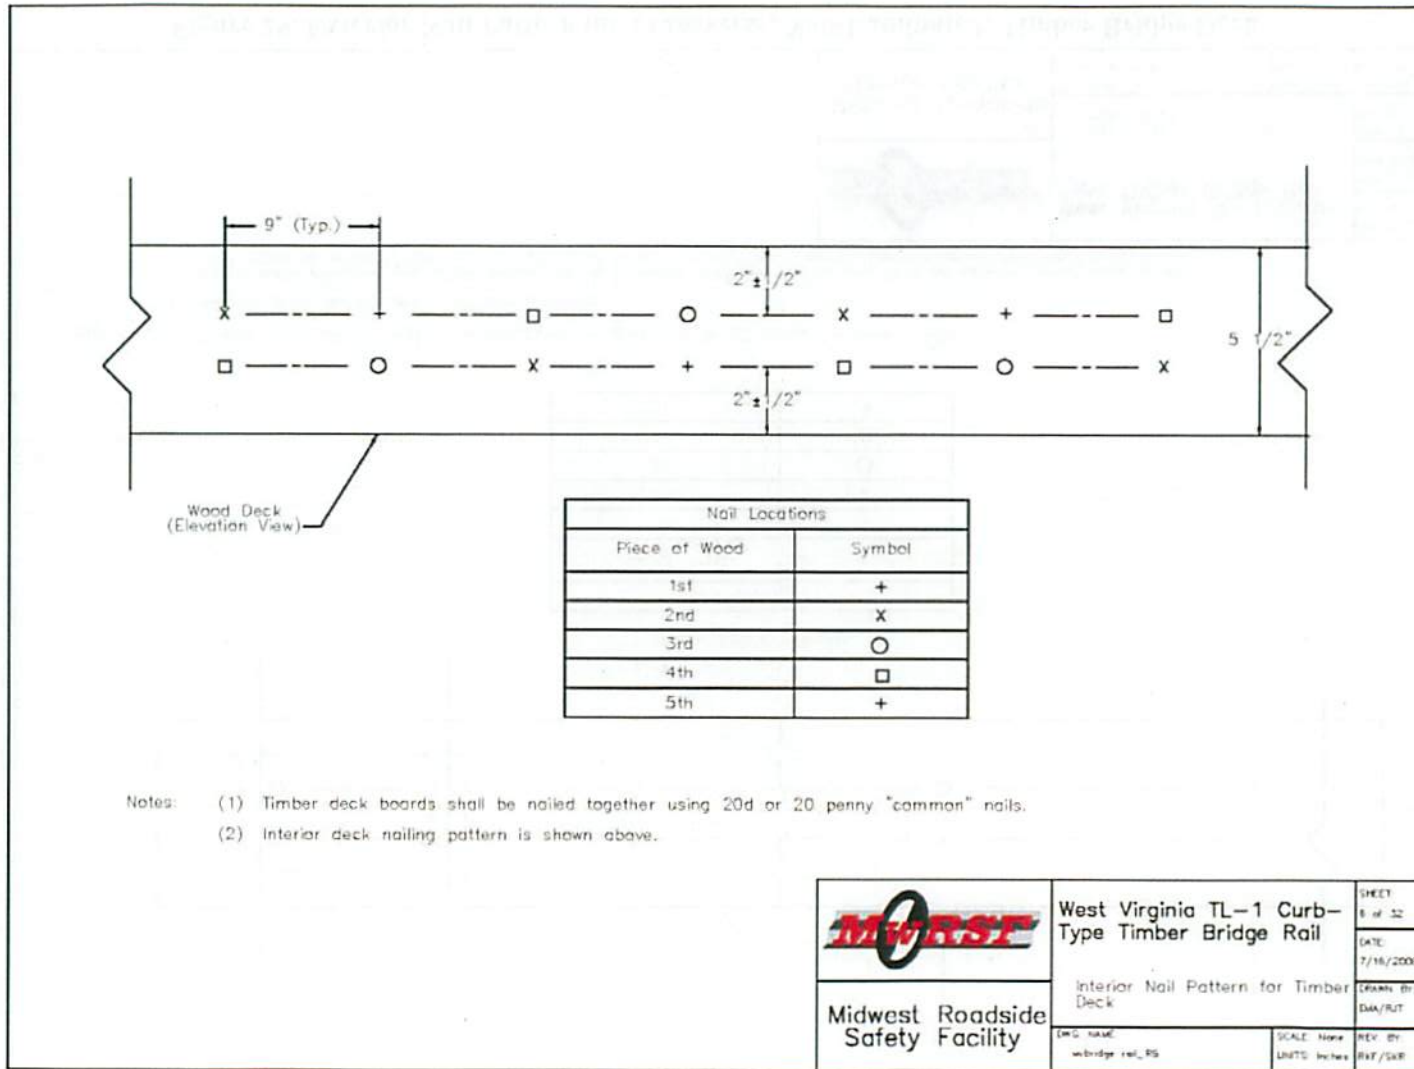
Nail Pattern for Transverse, Nail-Laminated, Timber Bridge Deck
